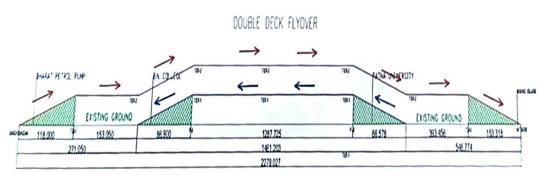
Sectional Elevation of Double decker flyover on Ashok Rajpath
